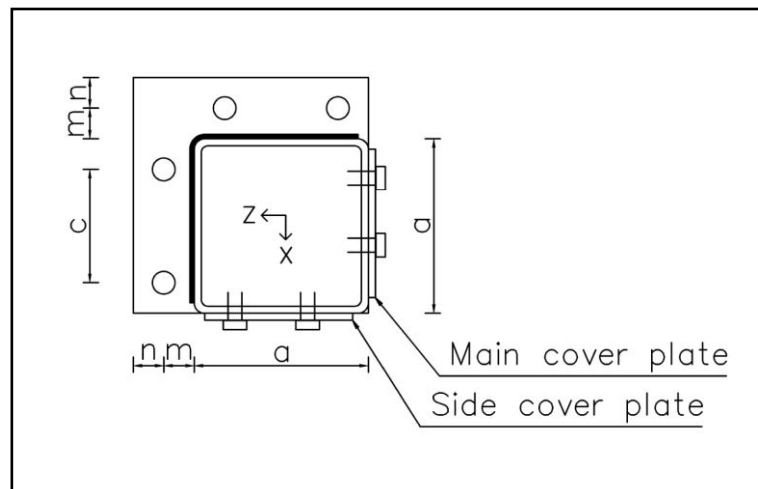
Bolt layout of non-symmetrical corner splice connection
